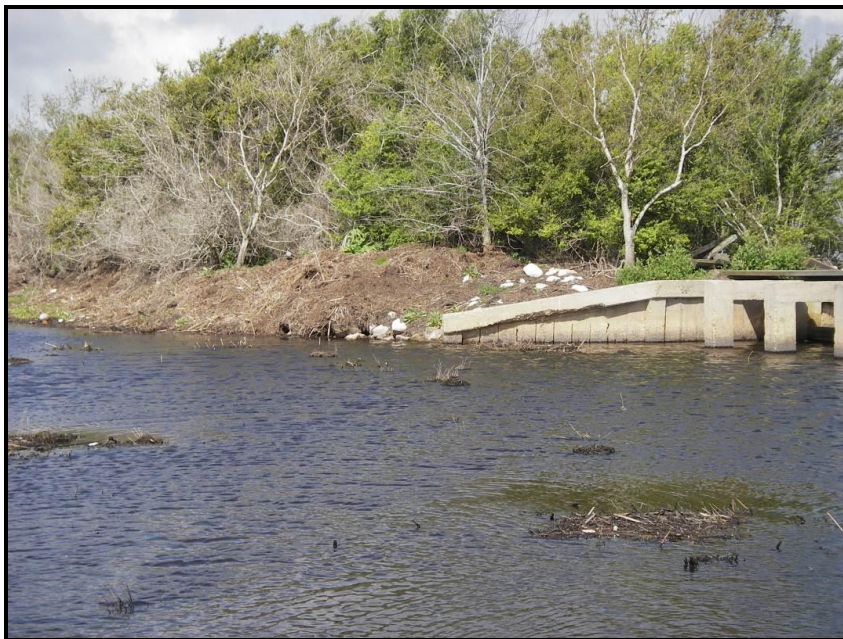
western wingwall rock on Stark's Central Canal Structure No. 4 (Dec. 6, 2007)
